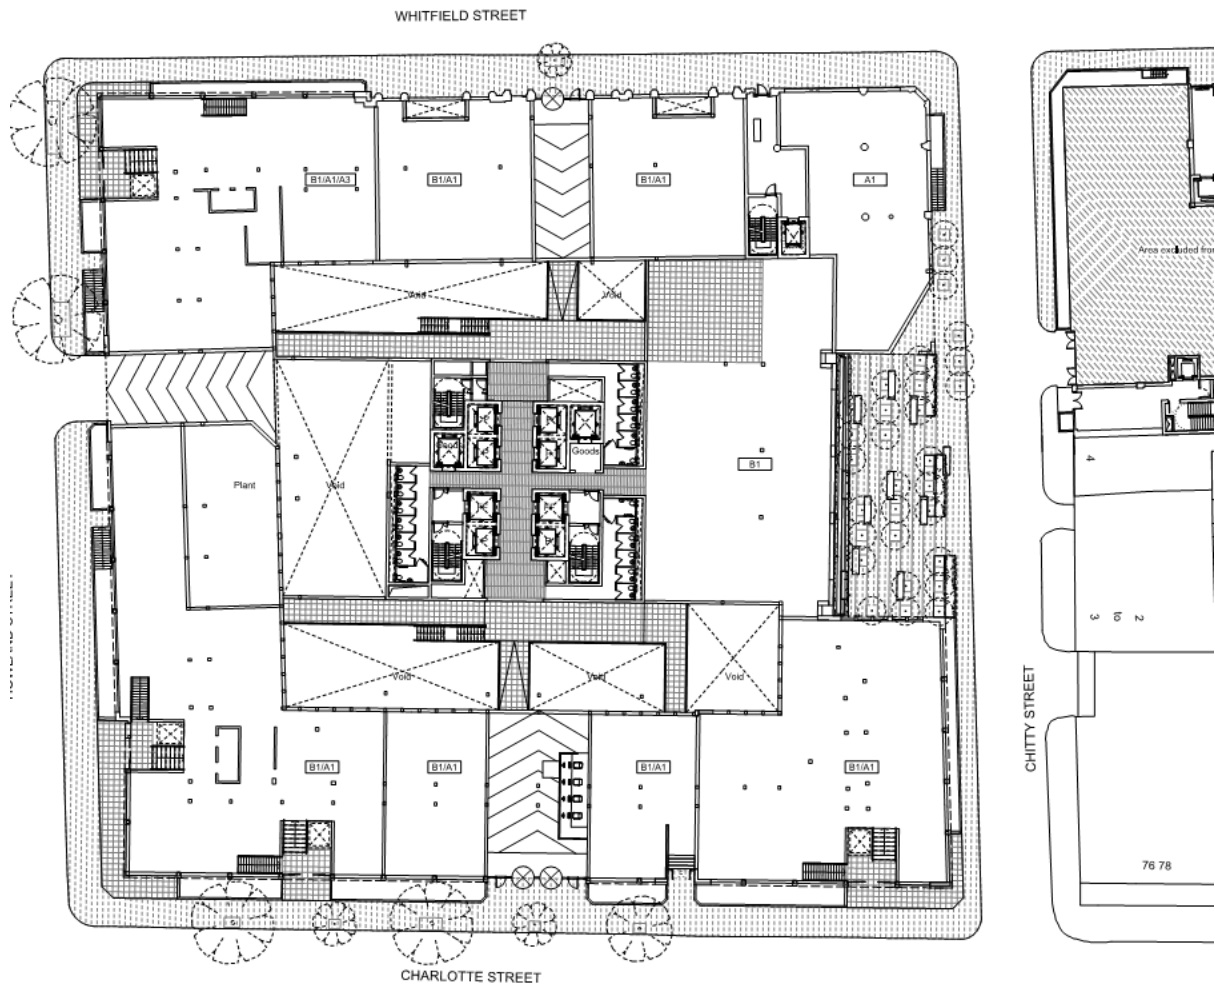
(Above) Ground floor plan approved under planning permission 2010/6873/P for 80 Charlotte Street
